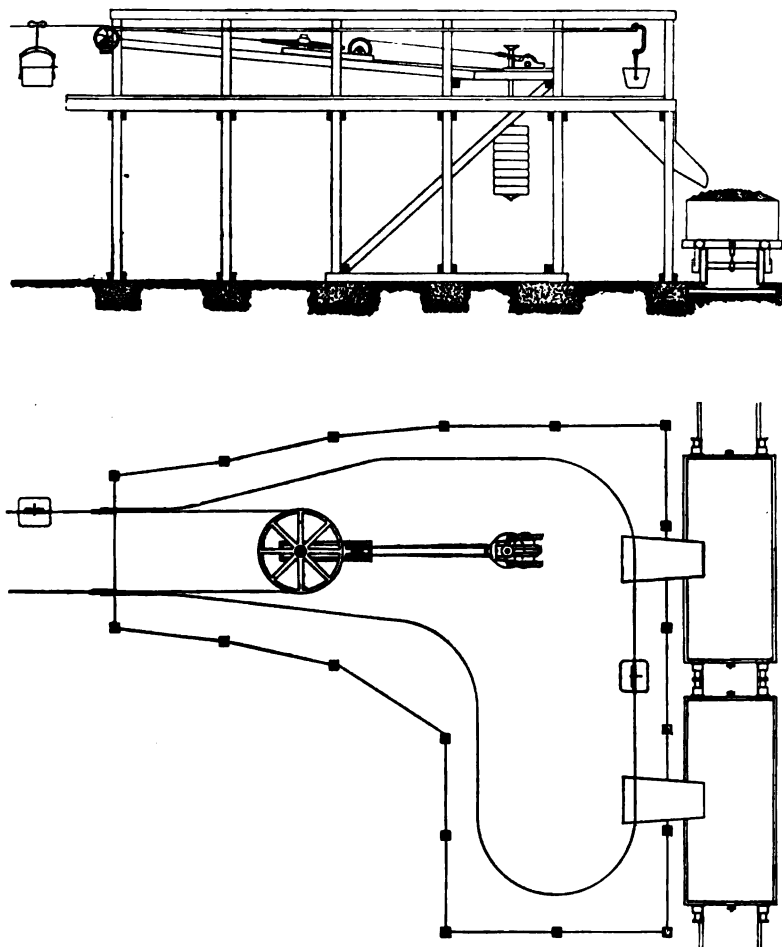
Plan and Elevation of Tension and Discharging Station.
